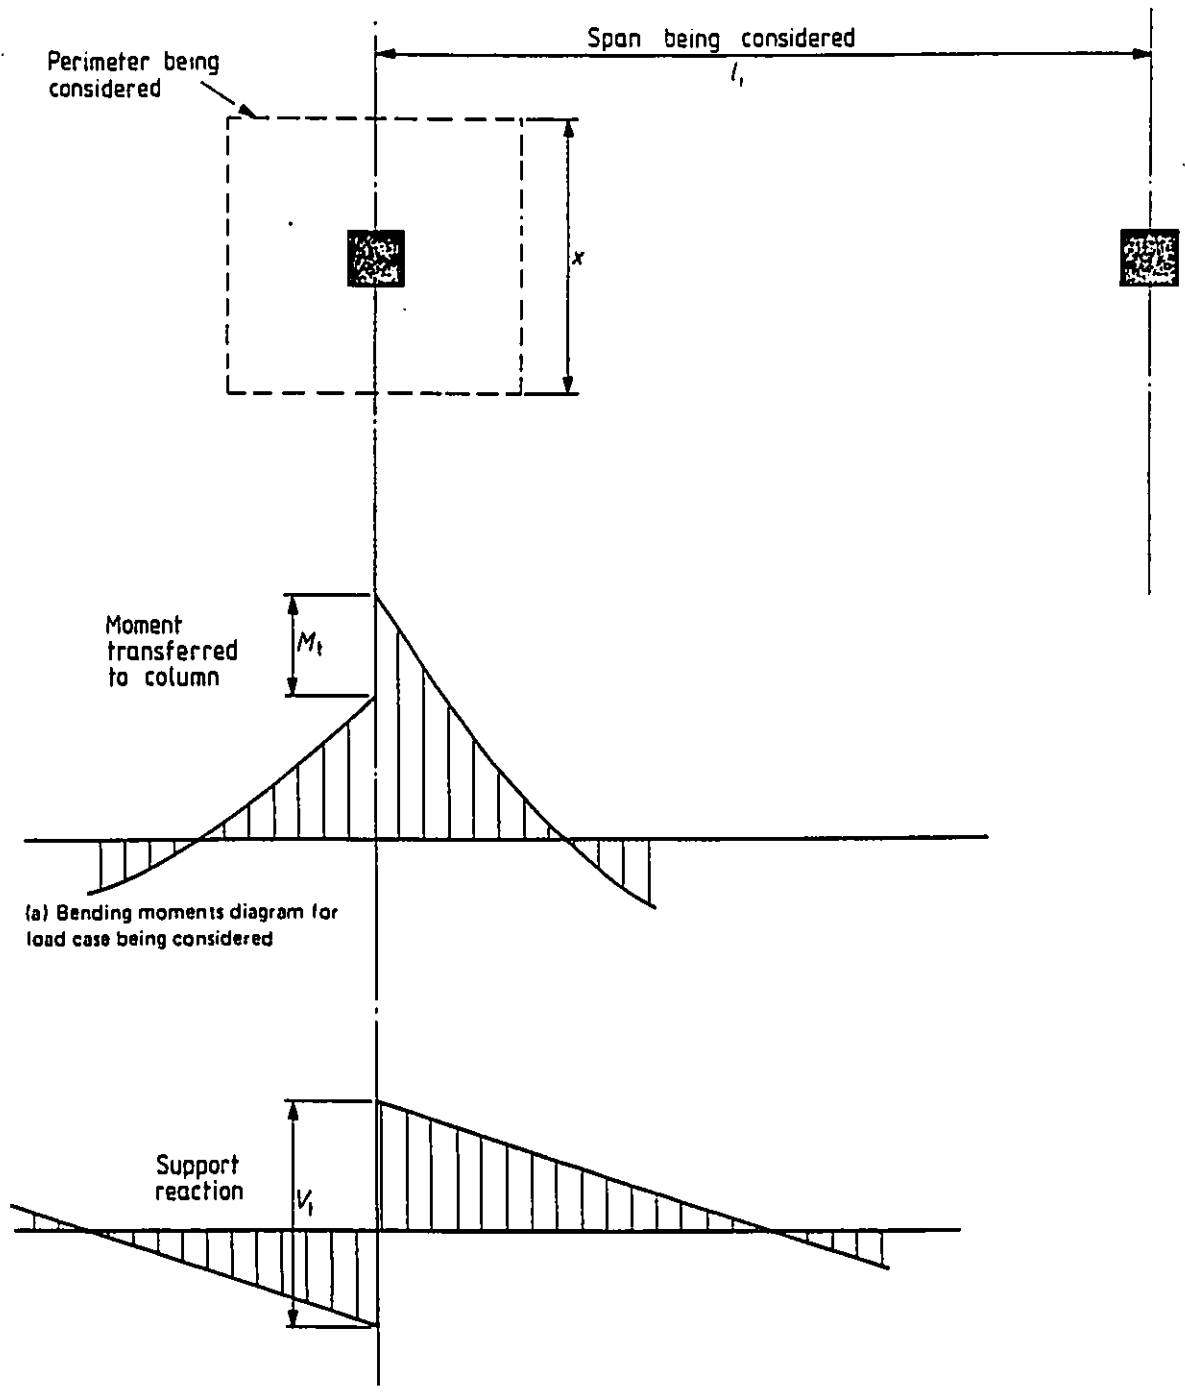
Shear at slab-column connections (BS 8110-85)
